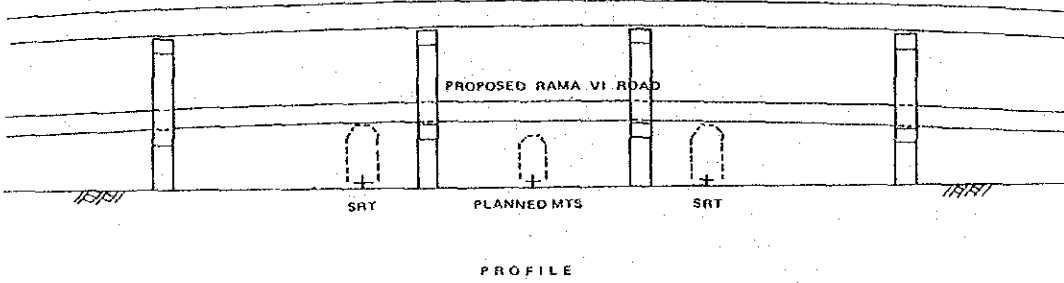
Joint Planned Projects at Grade Crossing No. 8
